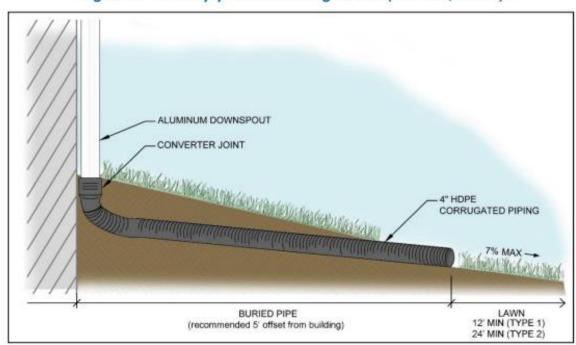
Buried pipe outlet configuration (Carmen, NCSU)
